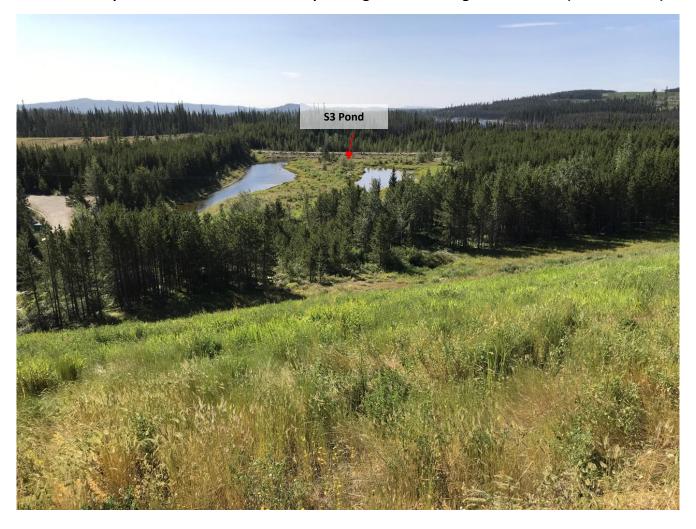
View of South Dam downstream slope looking southwest. Slope is vegetated and in good condition (HGH-2020-09)
